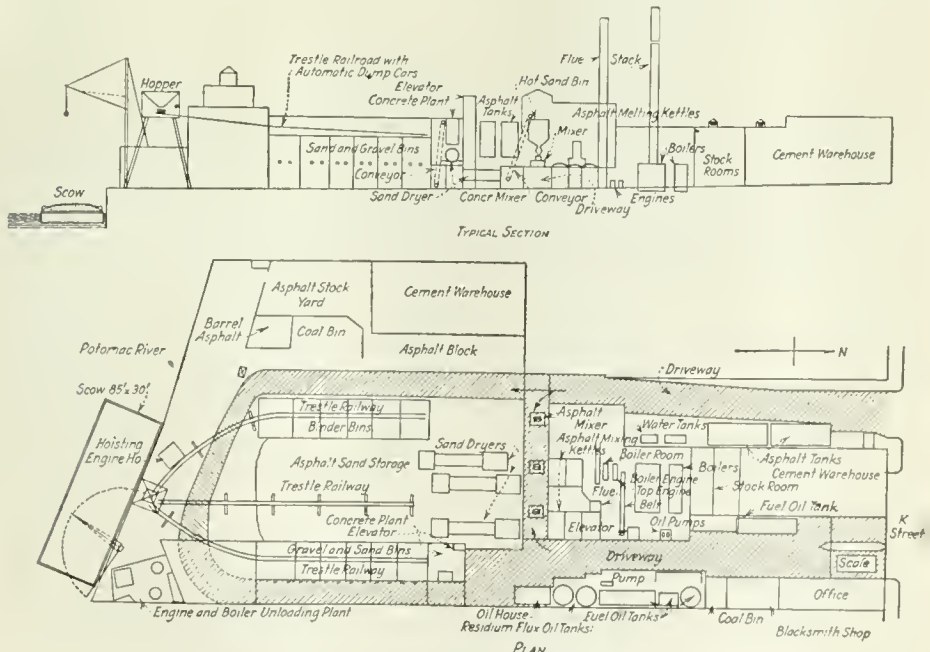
PLAN AND TYPICAL SECTION OF PLANT OF A WASHINGTON, D. C., ASPHALT PAVING CONTRACTOR.
